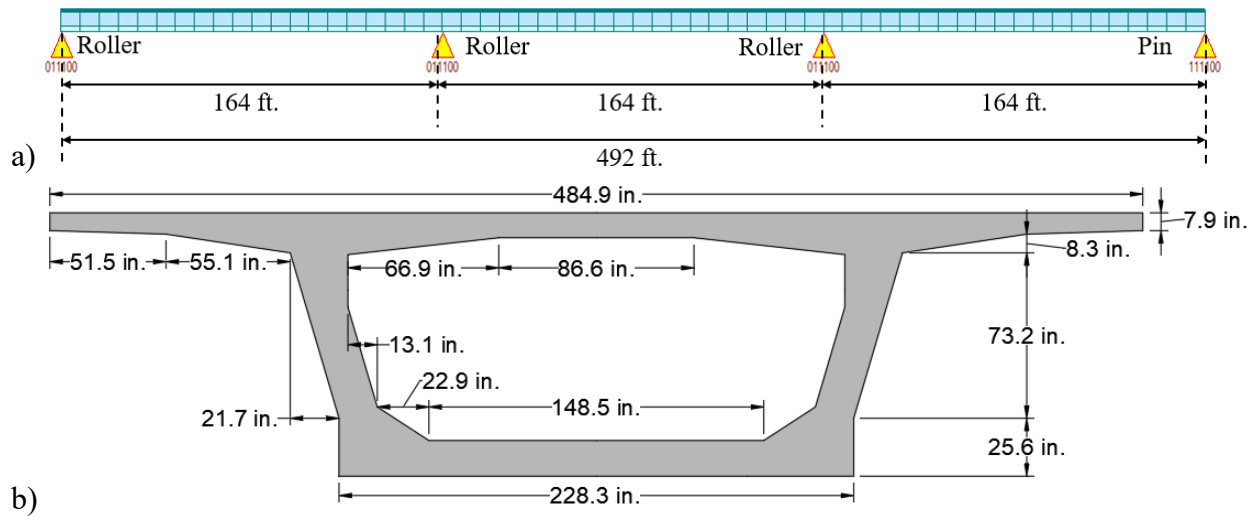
a) Elevation and b) Cross-Sectional Views of the Concrete Segmental Bridge Constructed with the Incremental Launching Method (Popok et al. 2024)
